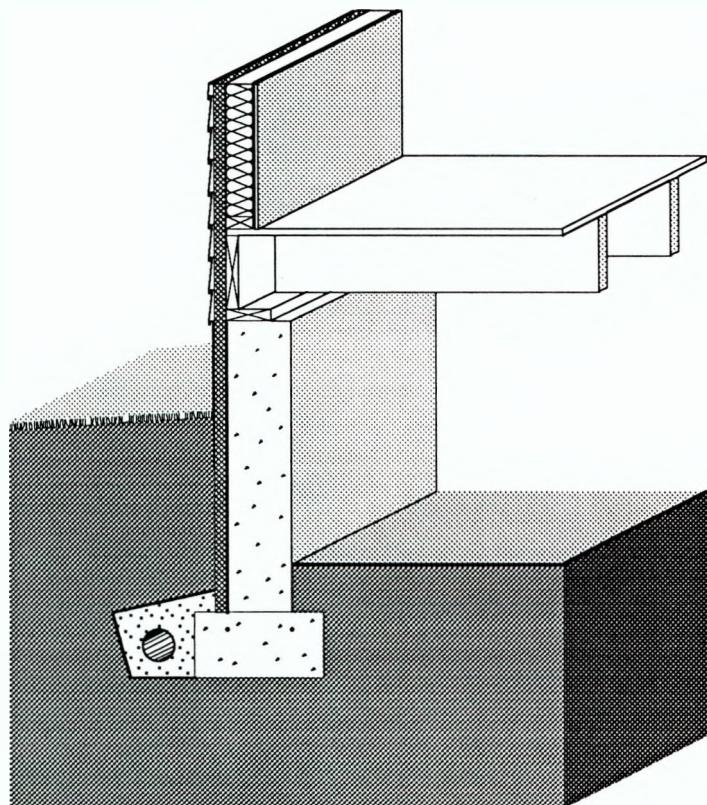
Concrete Crawl Space Wall with Exterior Insulation
